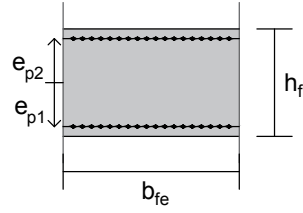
Prestress configuration in the massive floor element in y-direction
